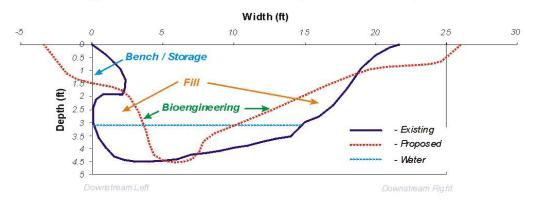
Proposed cross-section adjacent to area of existing pond/wetland feature.
